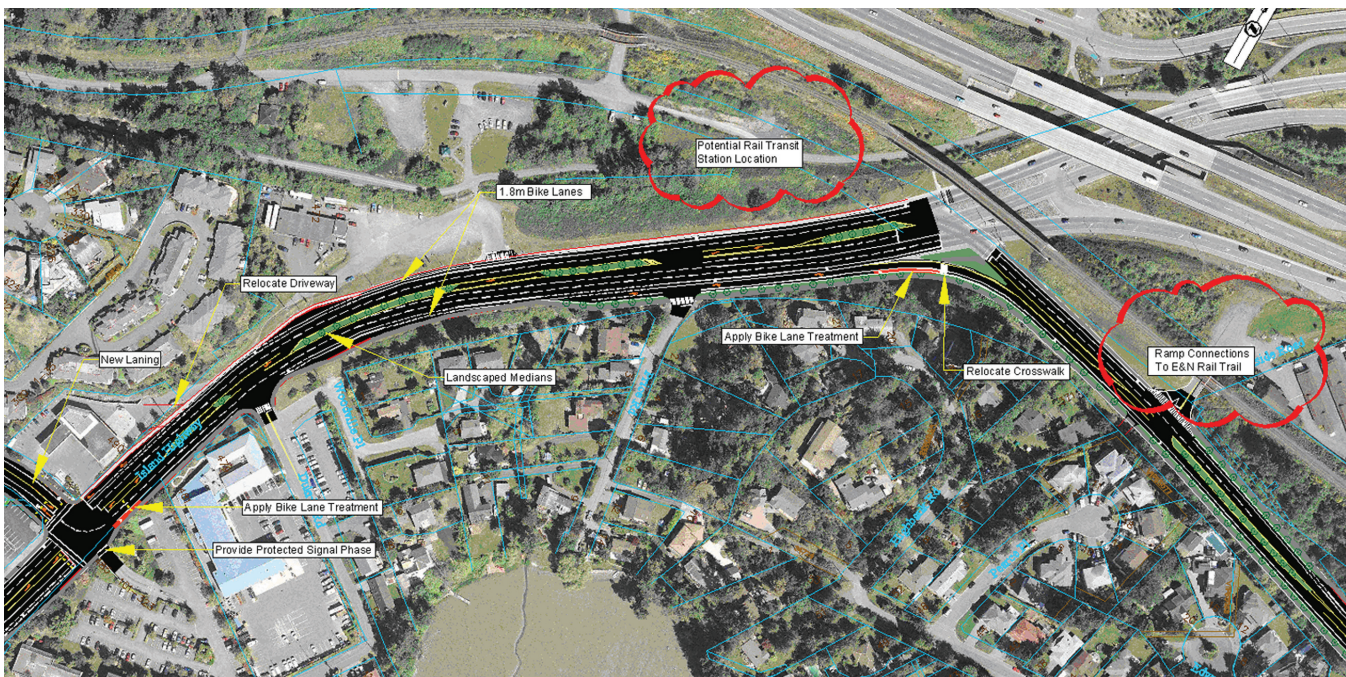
Island Highway from Six Mile Road to Kislingbury Lane / Knollwood Road
